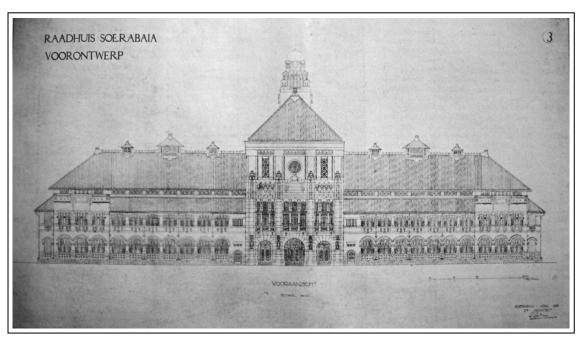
Town Hall in the Town Park: elevation of the front gable.
